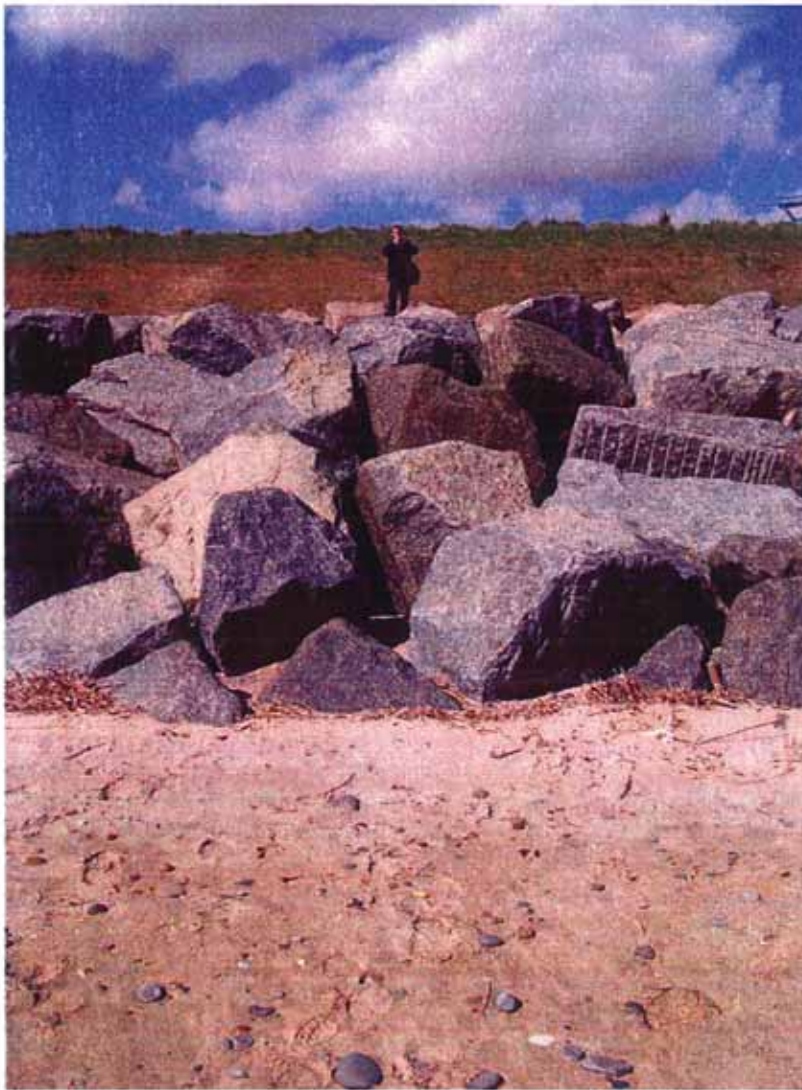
Top of the beach, revetment and slope at landfall location (see note on Plate 1)
